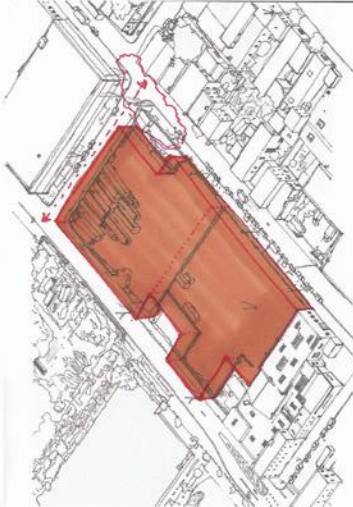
BUILD VOLUME (ELEVATED) & OPEN SPACE CONFIGURATIONS AT SITE 2 (YMCA-SITE, RICHARDS STREET CENTRAL)
